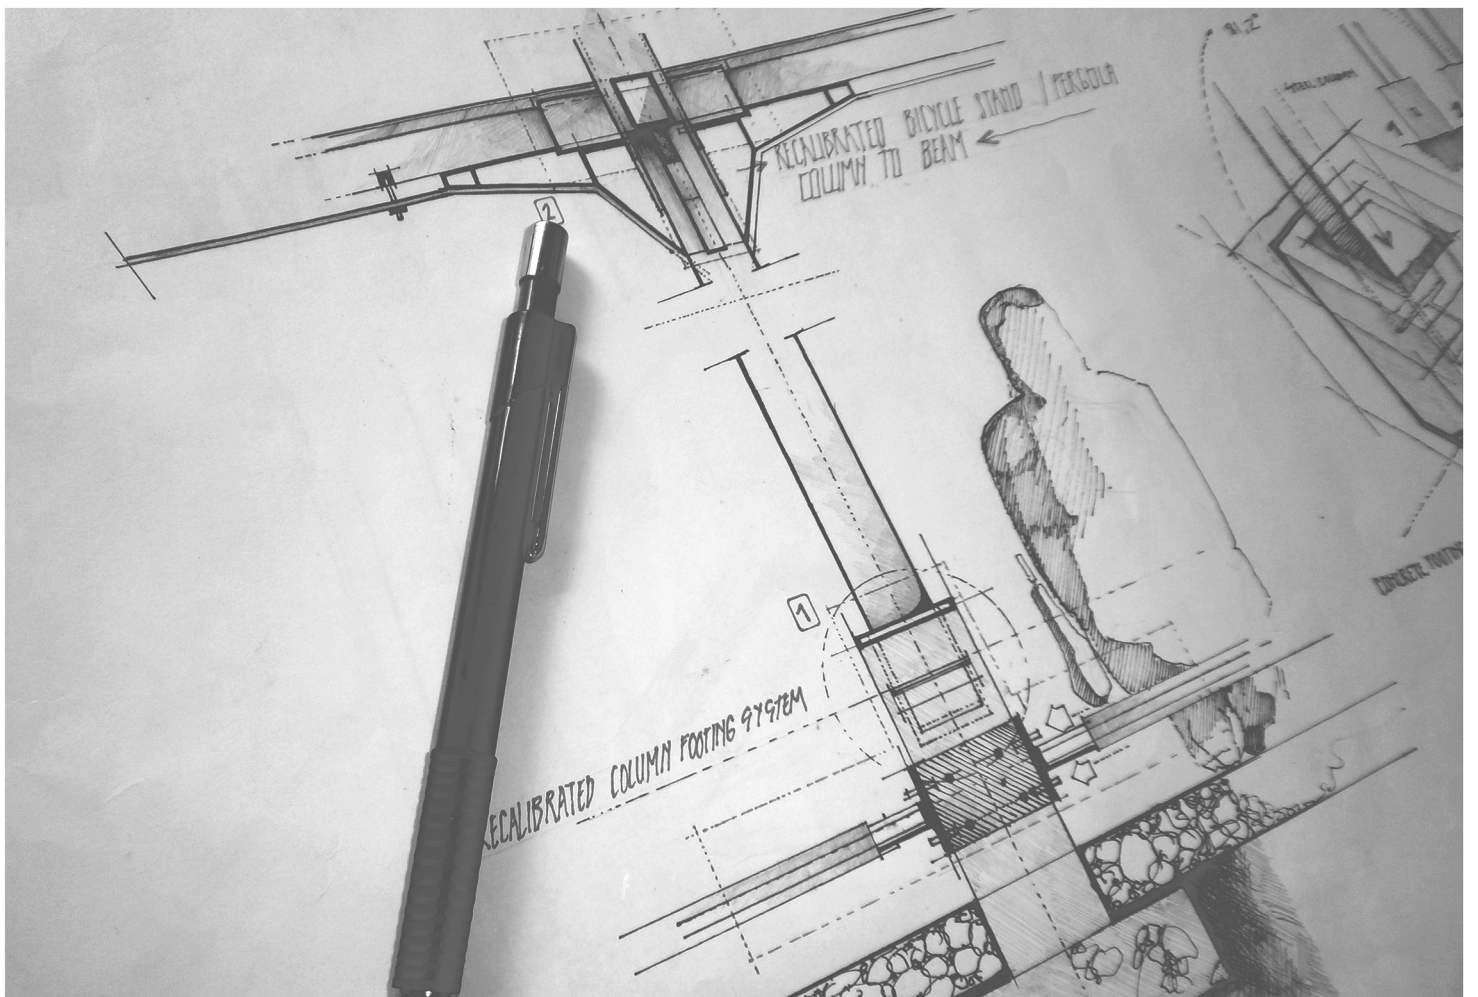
Exploration of detailing | mentis grid detail | beam to VWL connection
